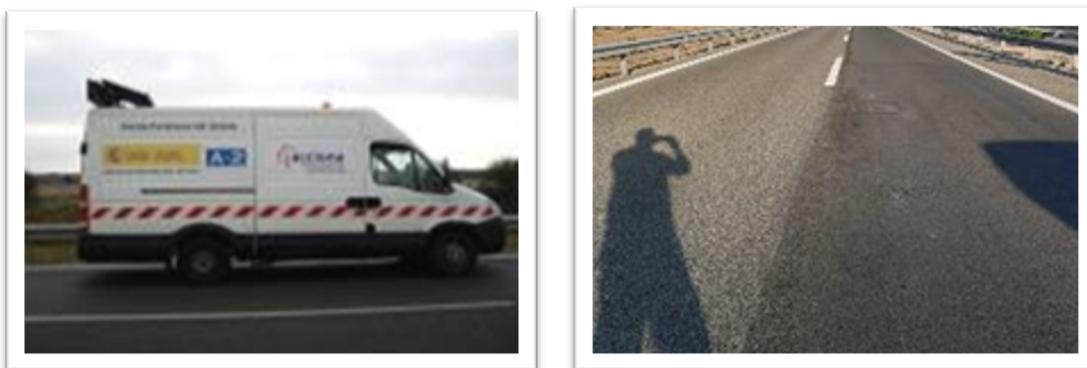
Traditional visual inspection (right) and typical general inspection van
